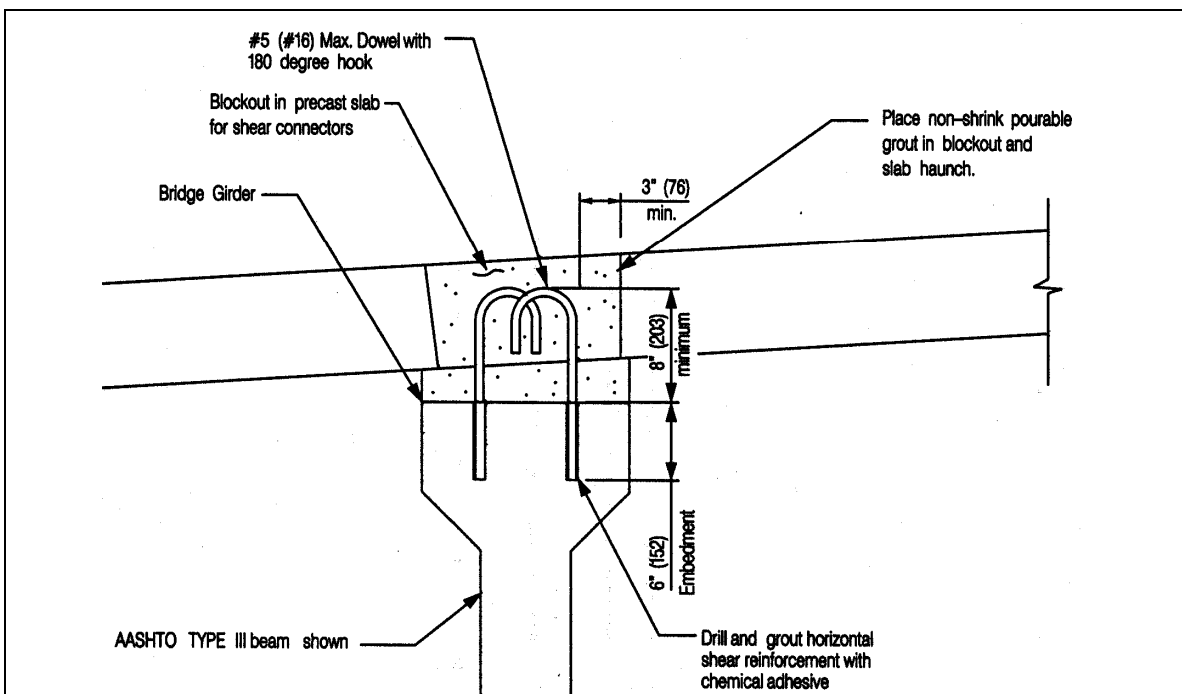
Typical existing concrete girder/deck connection (PCINER, 2002)
